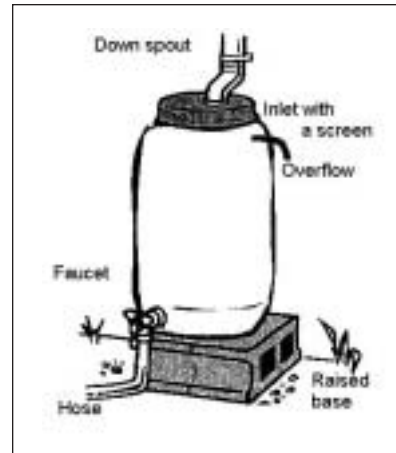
and Fig. 4-43b Rain barrels used to capture rainwater from roofs. Rain barrels can be connected to provide more storage capacity.
